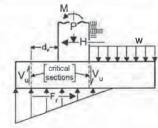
6.1-1—Example of Critical Section for Shear in Footings
